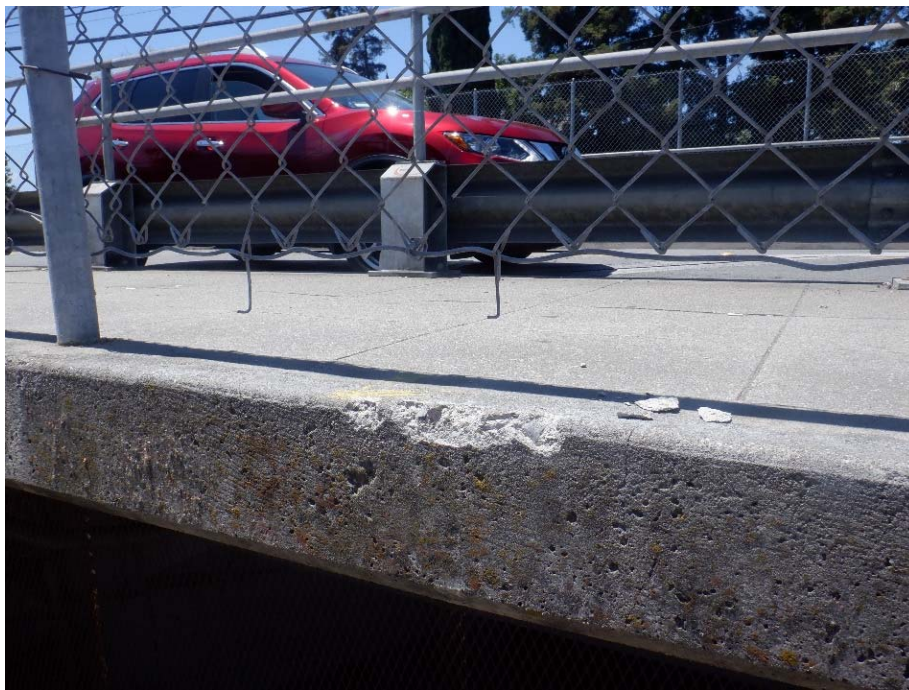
Location where concrete sample MKA-05 was collected at the northeast end of the bridge on the creek side of the sidewalk.
